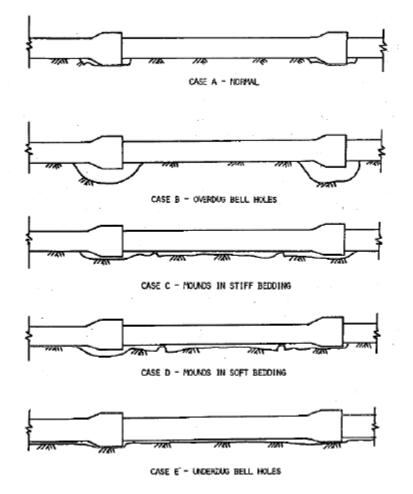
Incorrect Joint Installations (Jeyapalan and Abdel-Magid 1987)
